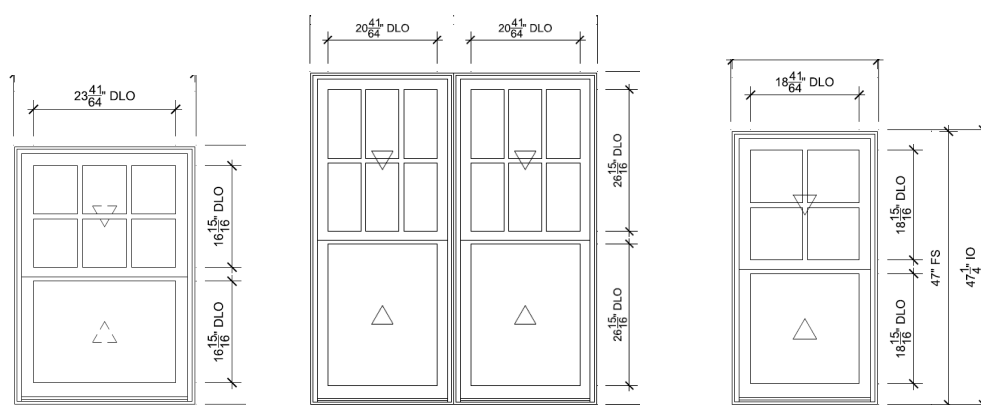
Sample profiles of the Marvin Elevate windows to be installed.
